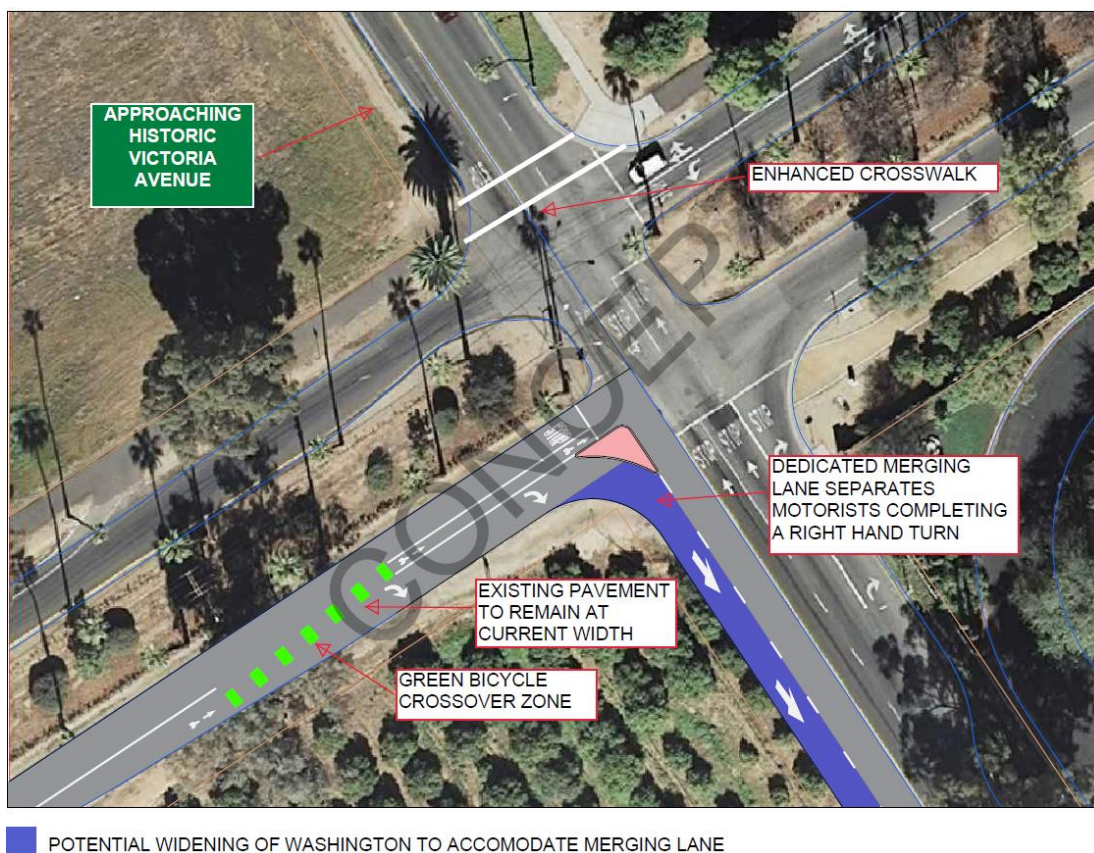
Refined Concept Illustration for Victoria Ave at Washington St, new pavement shown in blue.
